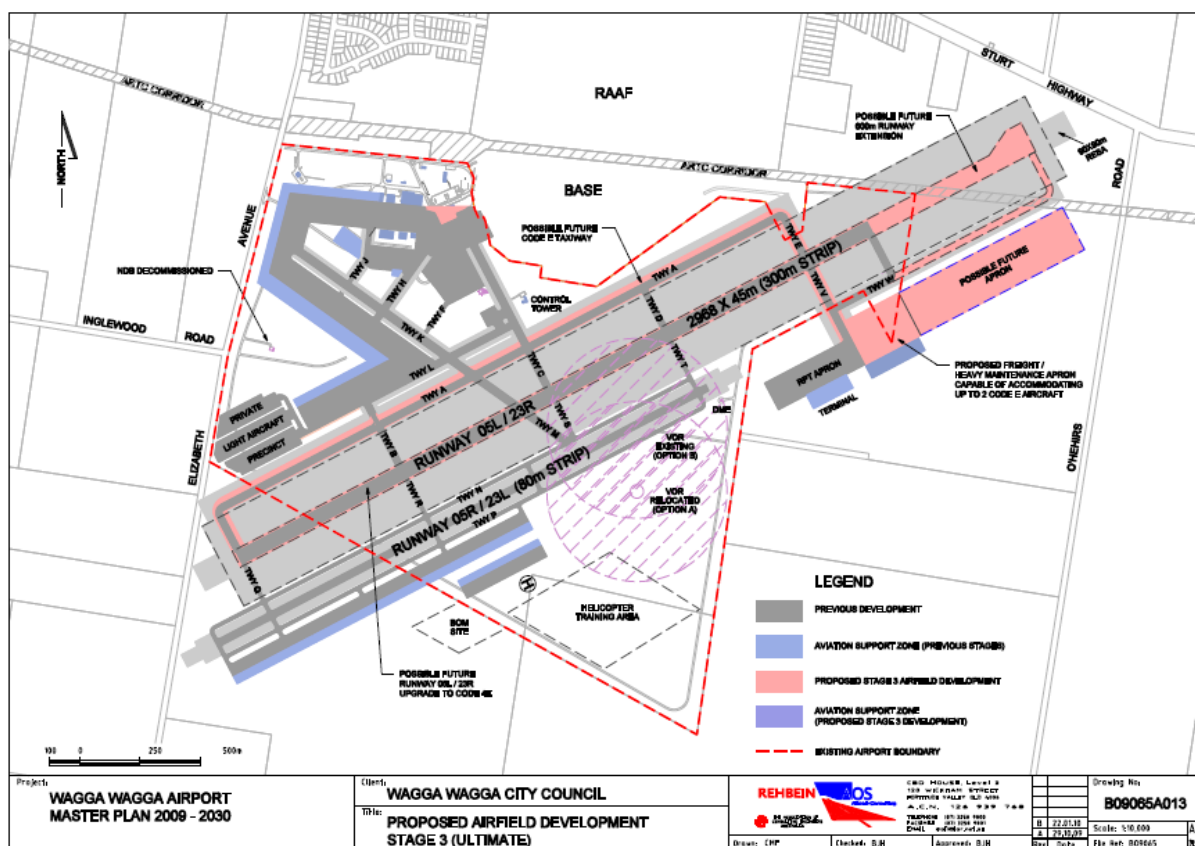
Extract from Airport Masterplan 2010- proposed ultimate runway layout
